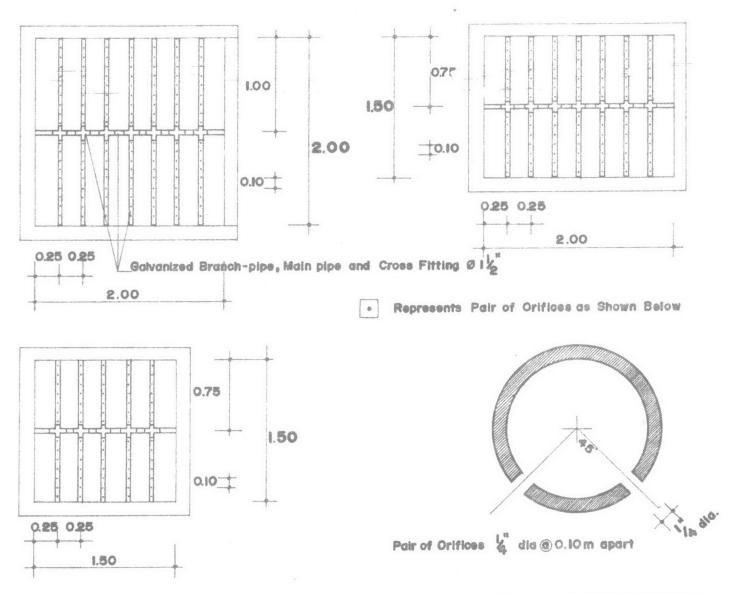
DETAILS OF UNDERDRAINAGE OF FILTER TANKS.
